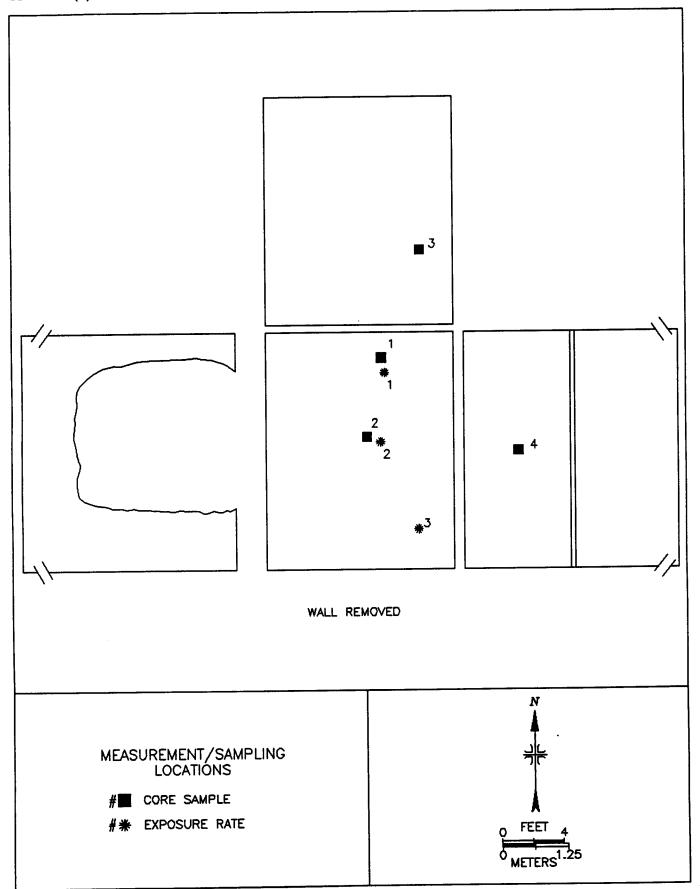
Building 059 North Test Cell — Exposure Rate Measurement and Sampling Locations
